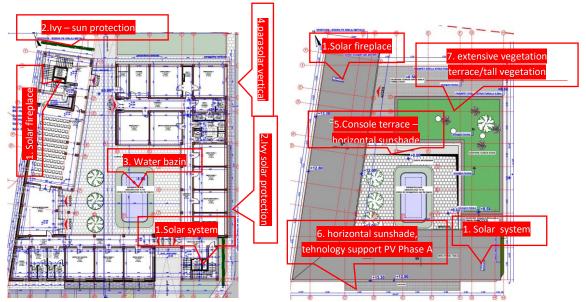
STAGE II CAD drawings, concept Diţoiu Nina-Cristina ⁸ Planimetry: ground floor/roofing initial draft mentioning relevant bioclimatic architecture: 1.Solar chimney (natural ventilation, vertical circulation space); 2. Ivy on a metallic frame – solar protection; 3. Water pool on the interior court (well-being during summer); 4. Vertical shading system – West orientation; 5. Cantilevered terrace south orientation – Horizontal sun shading; 6. Metal horizontal sun shading (Metallic structure that support photovoltaic panels); 7. extensive vegetation terrace / high vegetation (well-being) -
